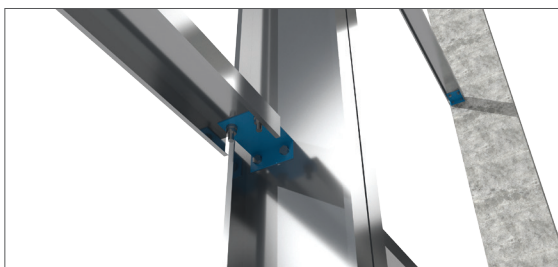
Detail of a joint of the column and one or two stabilising members. The stabilising members are attached to the column by means of connecting angle pieces and M16 bolts. There must always be a liner between the column forming C sections at the point of the node. The stabilising member section does not have to be of the same height as the column section. The recommended minimum heights of the stabilising sections are shown in Table 32.
